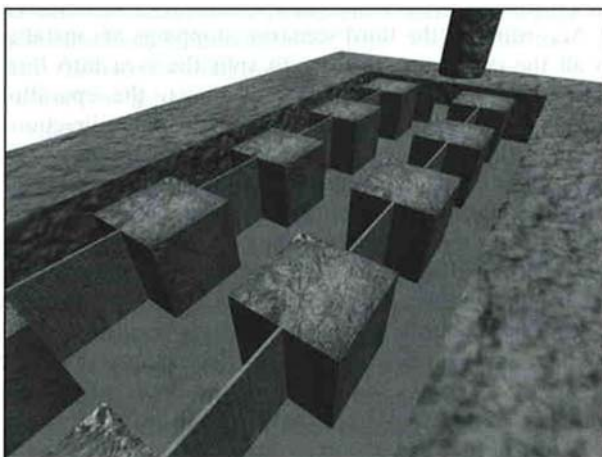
Three-dimensional view of the layout of the underground area after the installation of stoppings.
